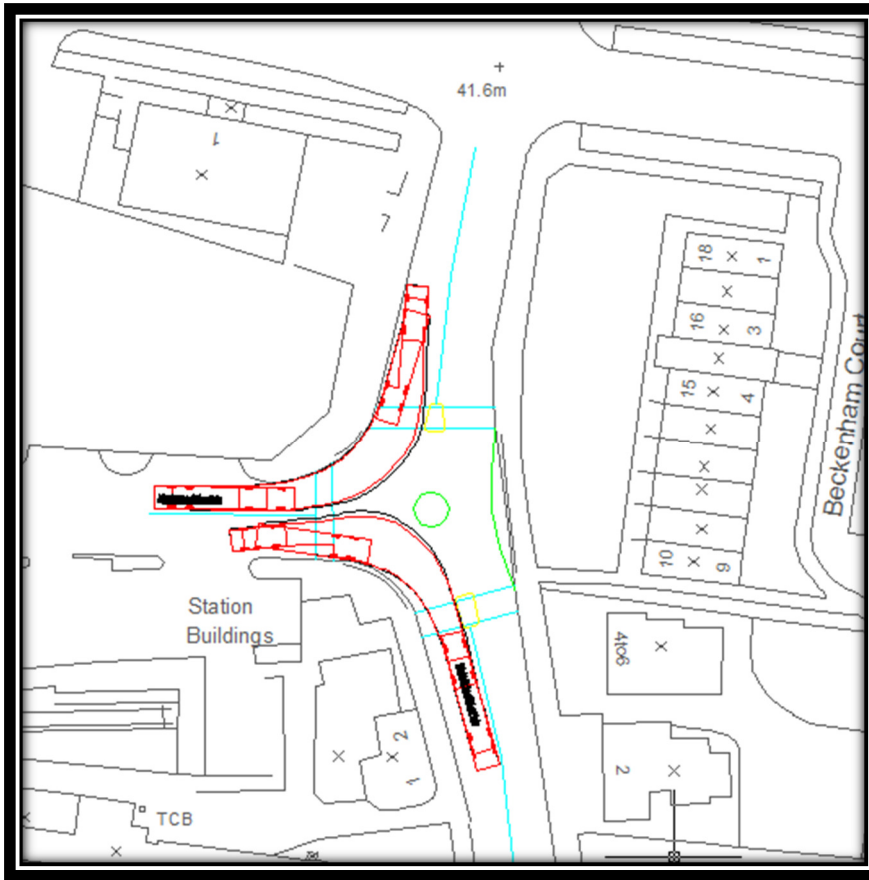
Proposed Junction 1 Southend Road – Waitrose Entrance Proposed Design
